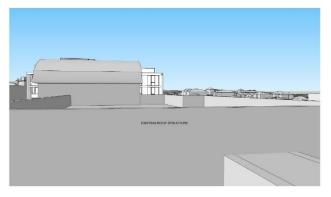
View from 80 Ebley Street (Genoa Tower) - RL105.5, standing at mid-tower level
